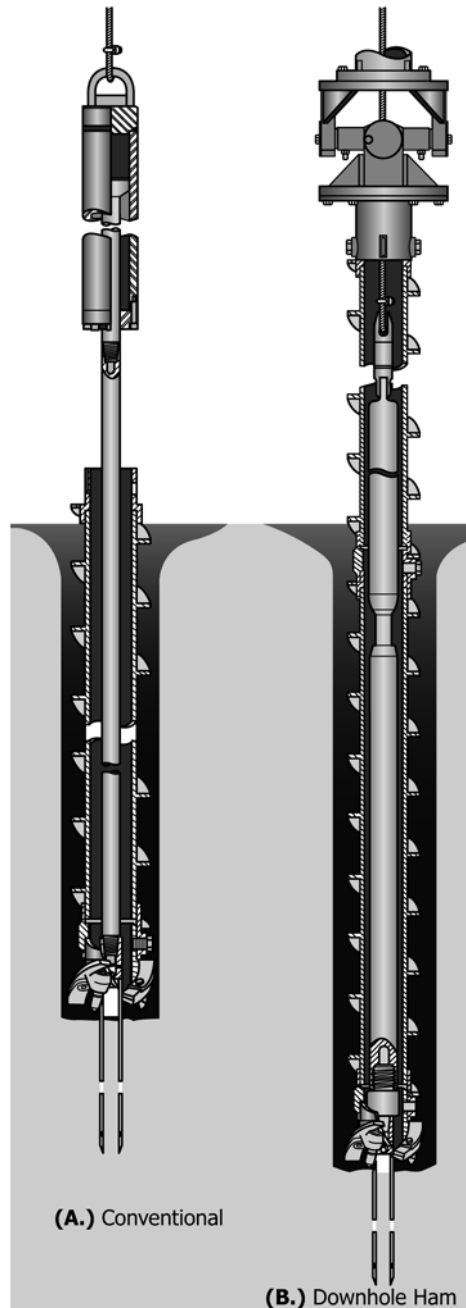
In-Hole-Hammer and Conventional Drive Hammer
